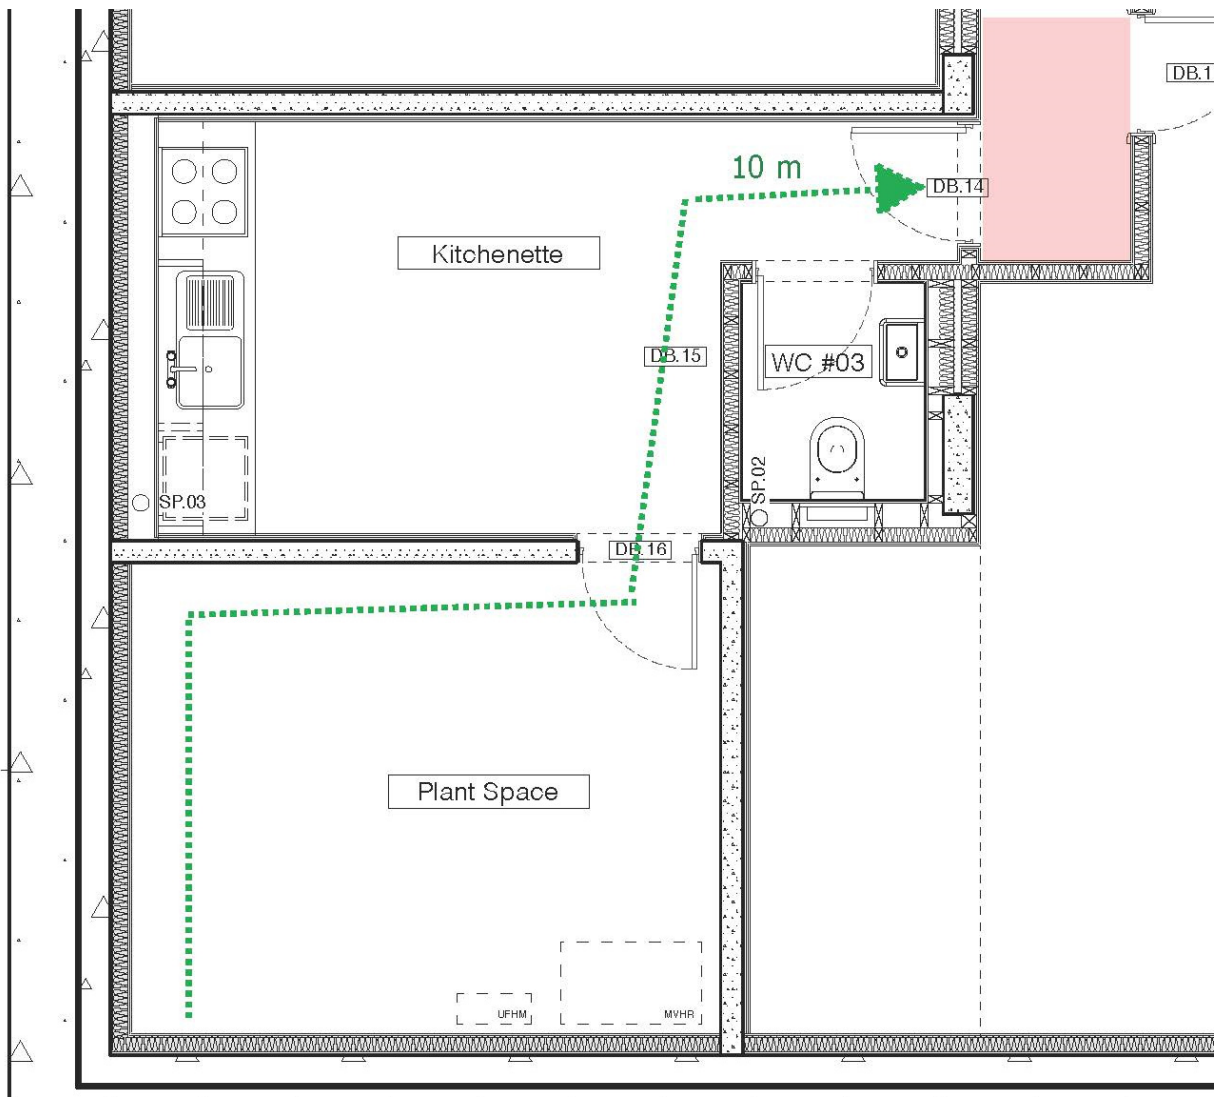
Plant Space Escaping via Kitchenette at Basement Level
